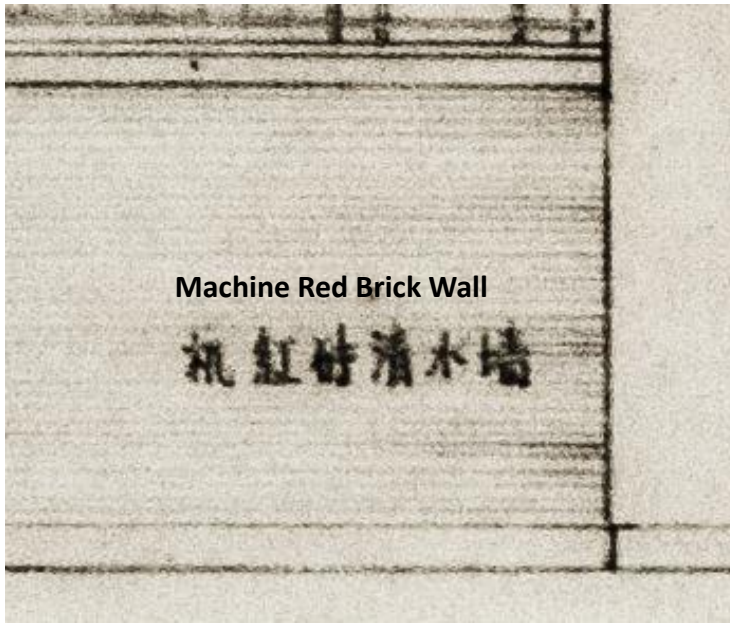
The Amplification of the Brick Wall Part of the West Elevation.
